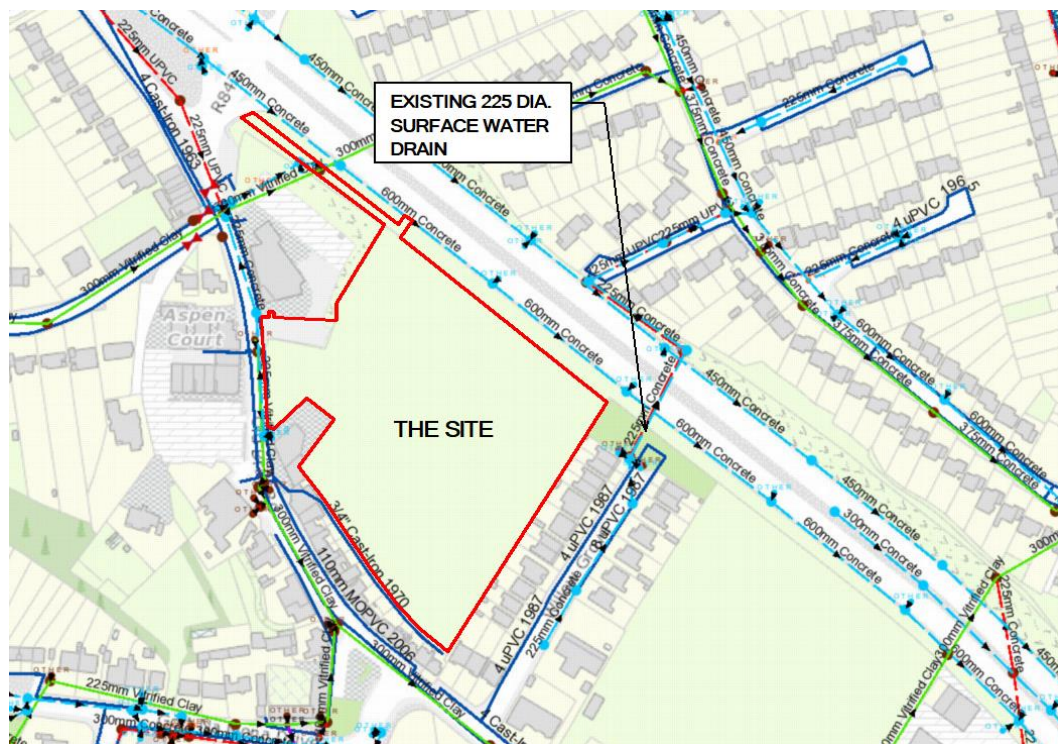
Extract from Irish Water Network Plan (Site Boundary Indicative Only)
